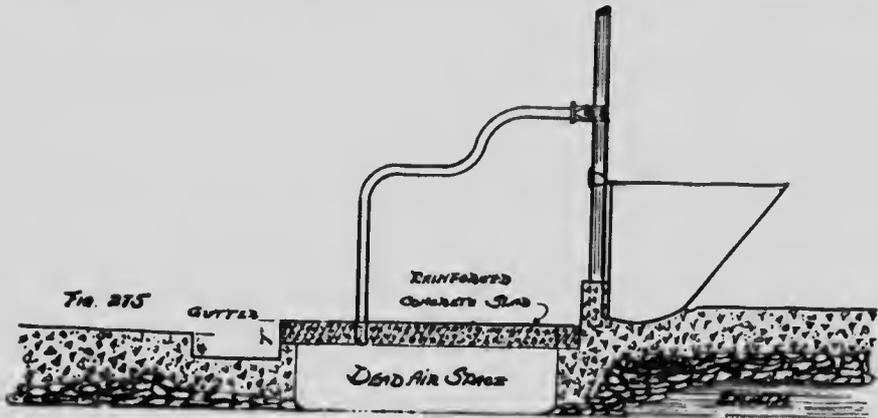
shows how some stable floors are constructed with a dead-air space below to keep the standing platform dry. A reinforced concrete slab 4 in. thick is used. Such a floor has to be very carefully constructed.
